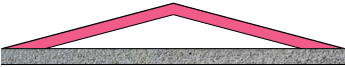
| CROSS-SECTION OF PITCH ROOF CONSTRUCTION WITH CONCRETE AS CEILING
